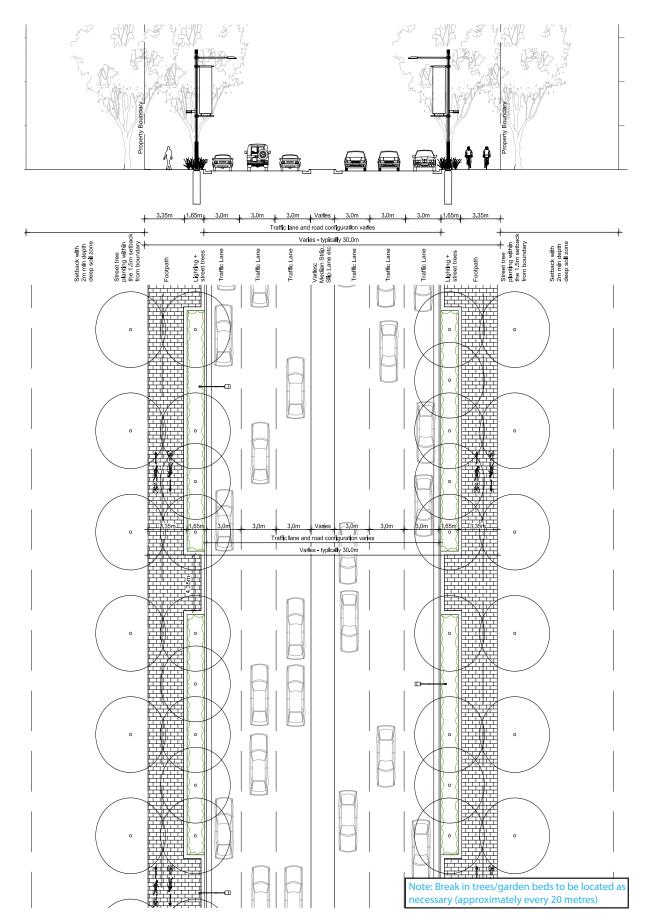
Delhi Road Layout - typically 30 metres wide (NOT TO SCALE)
